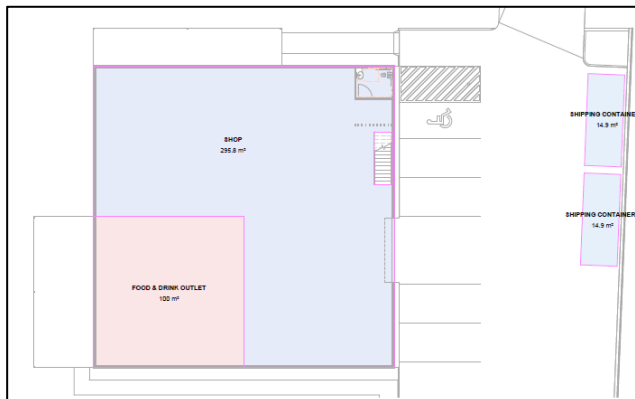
PROPOSAL PLAN EXTRACT (SITE PLAN)
